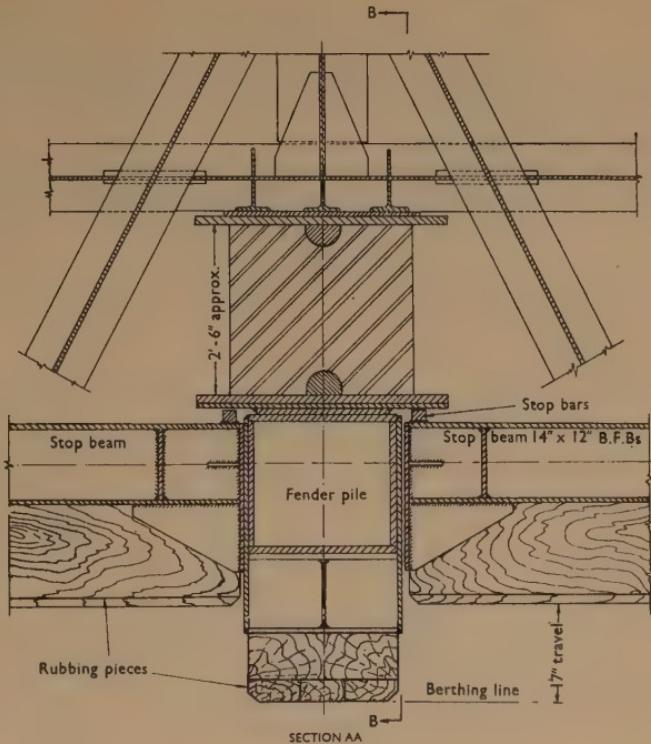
SECTION SHOWING RUBBER BLOCK MOUNTING
